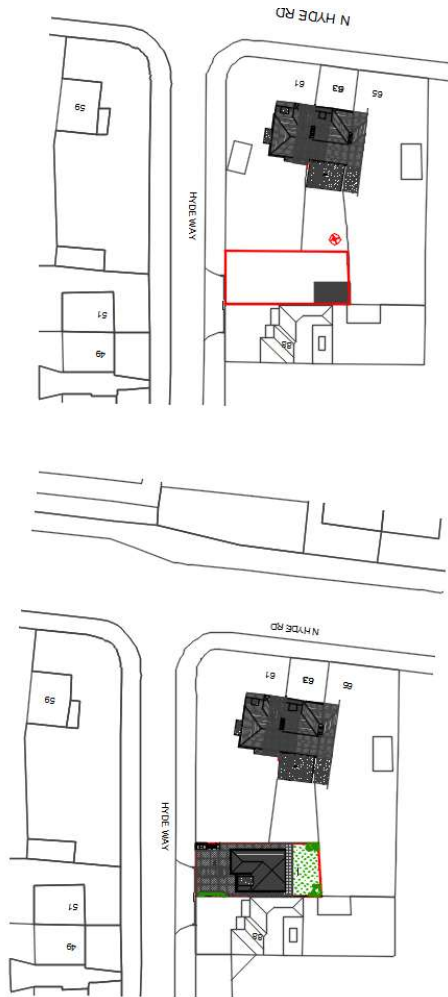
Block diagram for Existing (Top) and Proposed site (Bottom)
